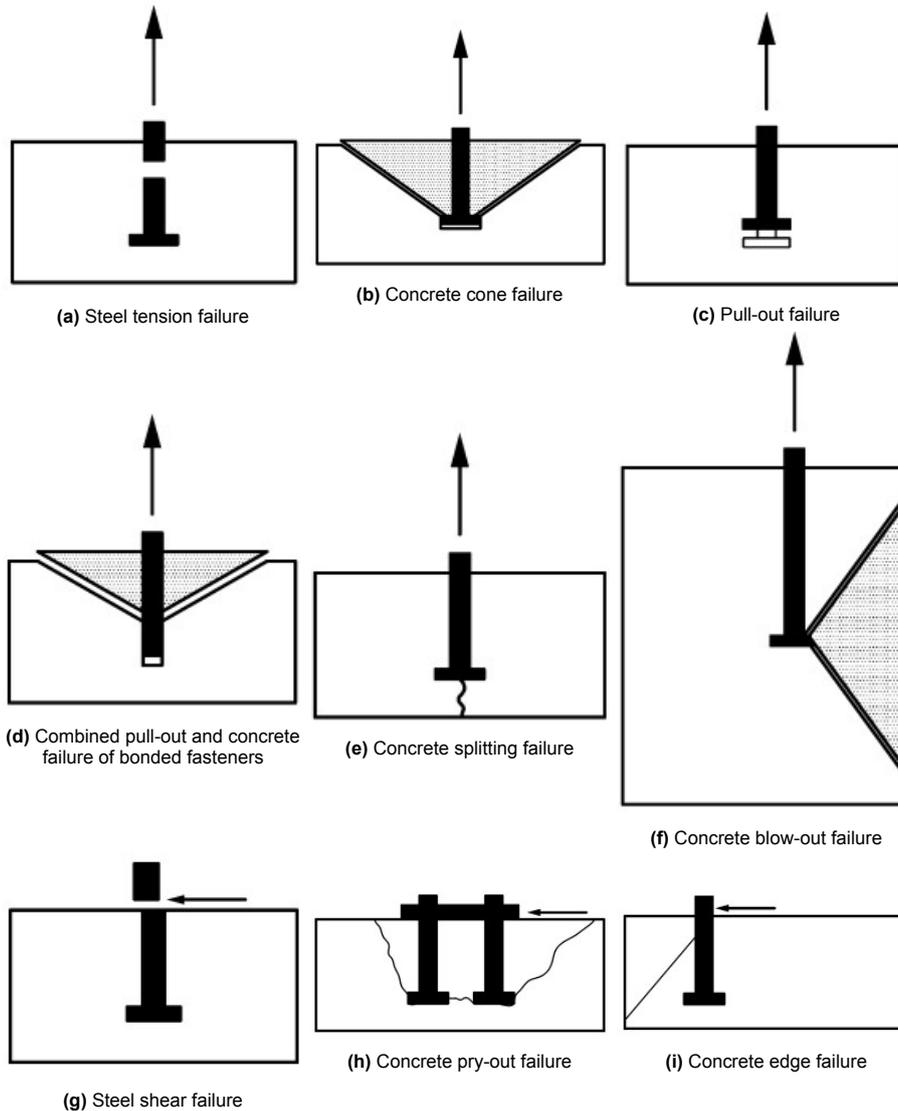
Failure mechanisms of anchor bolt [49]
